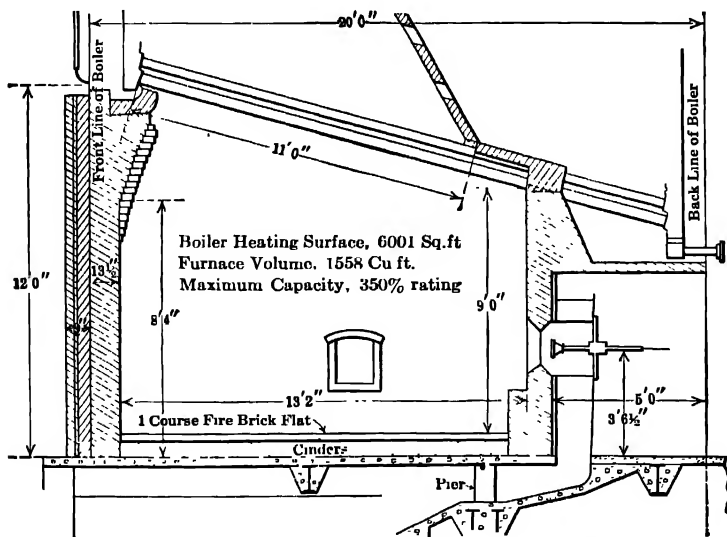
Oil-fired Furnace. Narragansett Elec. Lt. Co., Mechanical Burner.
